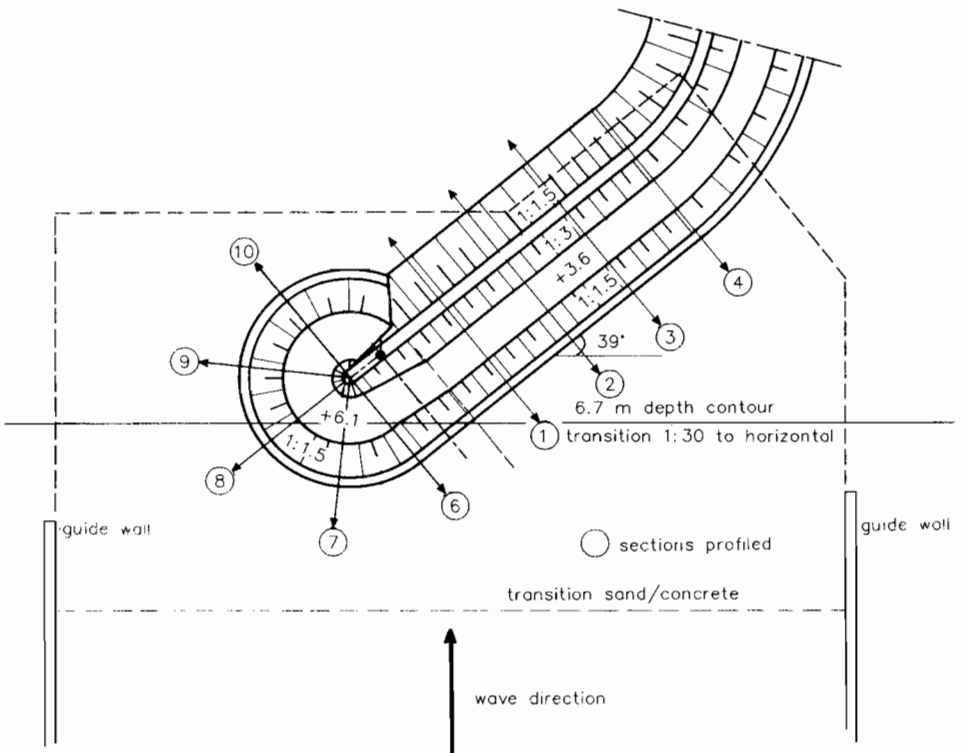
Lay-out of the berm breakwater tested in a wave basin (cross-sections see Fig. 1).
